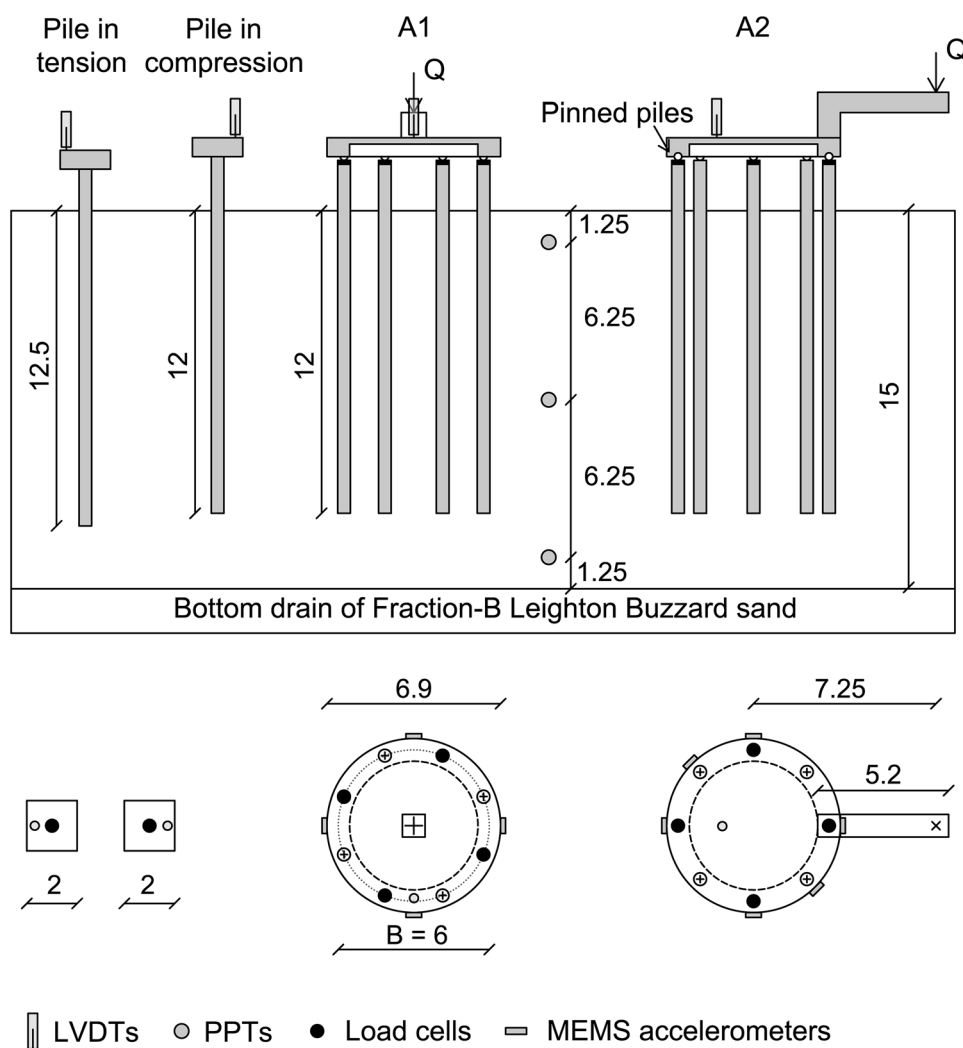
Plan view and cross-section of the model foundations tested in the centrifuge and soil properties; dimensions (m) are given at prototype scale
